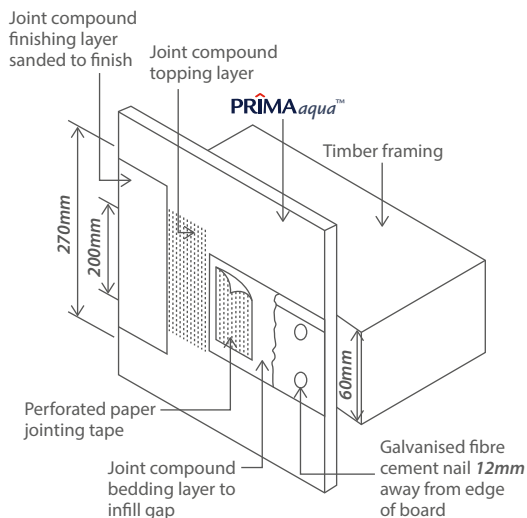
Flush Joint Detail (Untiled Wall and Ceiling)
